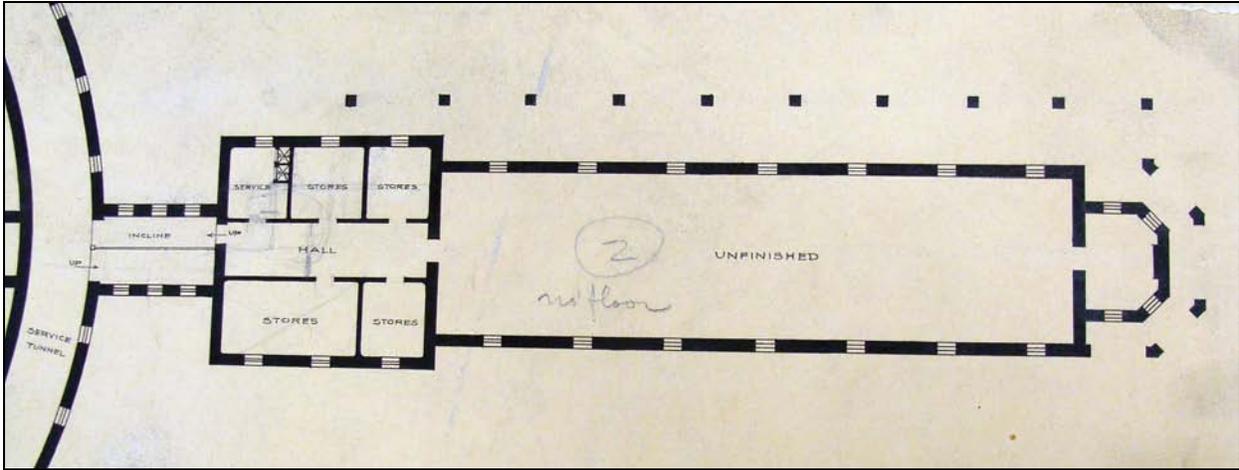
Excerpt of "Proposed Battle Mountain Sanitarium Basement Floor Plan"
